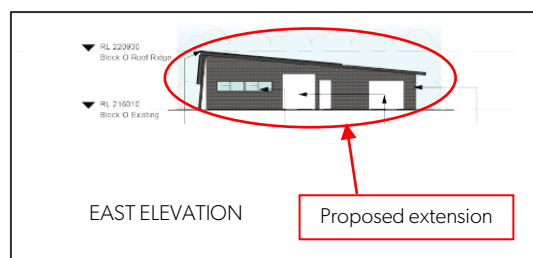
| Proposed east elevation of the metal works building extension (source: Section 4.55 Modification Application, 2019)
